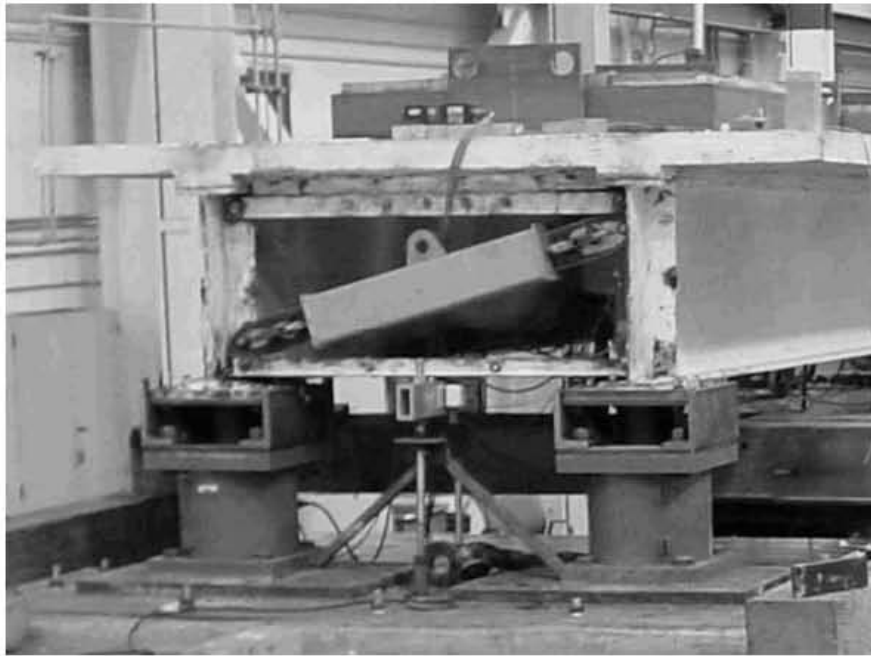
“Light” end cross frames in the bridge model
